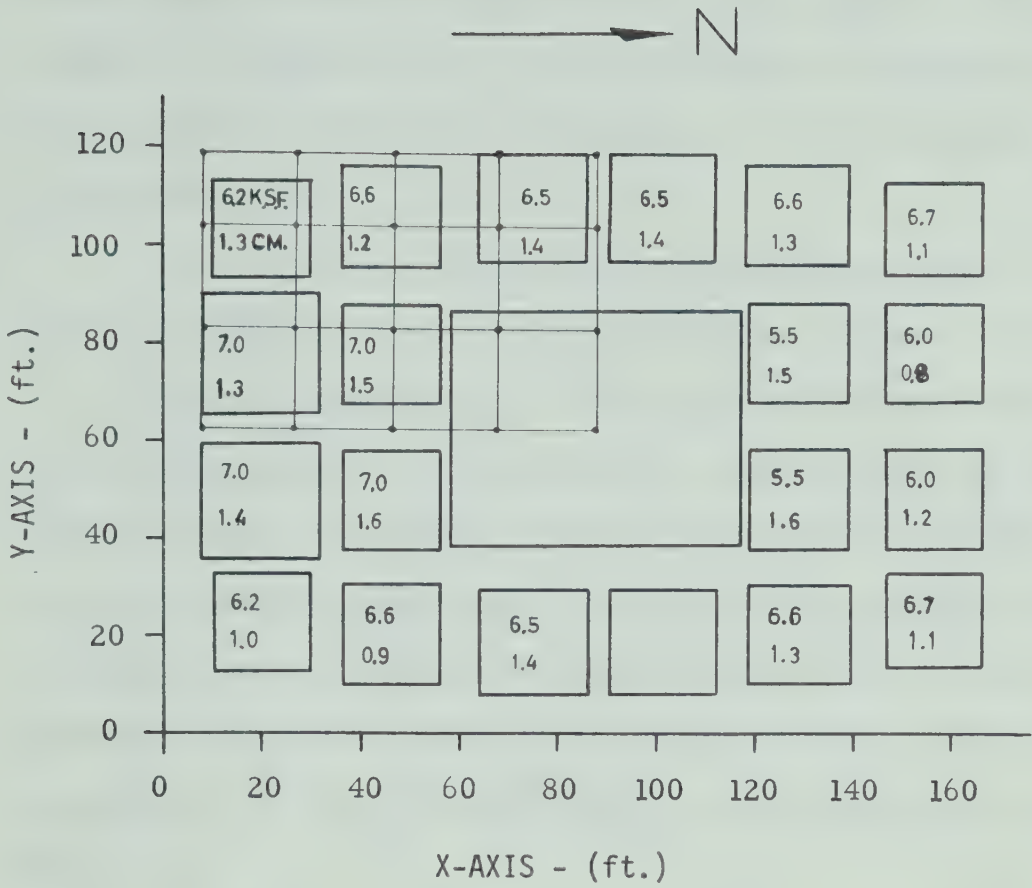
FOOTRING PLAN OF CN TOWER SHOWING NET APPLIED DEAD LOADS WITH THEIR CORRESPONDING SETTLEMENTS PLUS THE SUPERIMPOSED LOADING SECTION OF THE THREE - DIMENSIONAL FINITE ELEMENT GRID IN THE SOUTH-WEST QUADRANT
